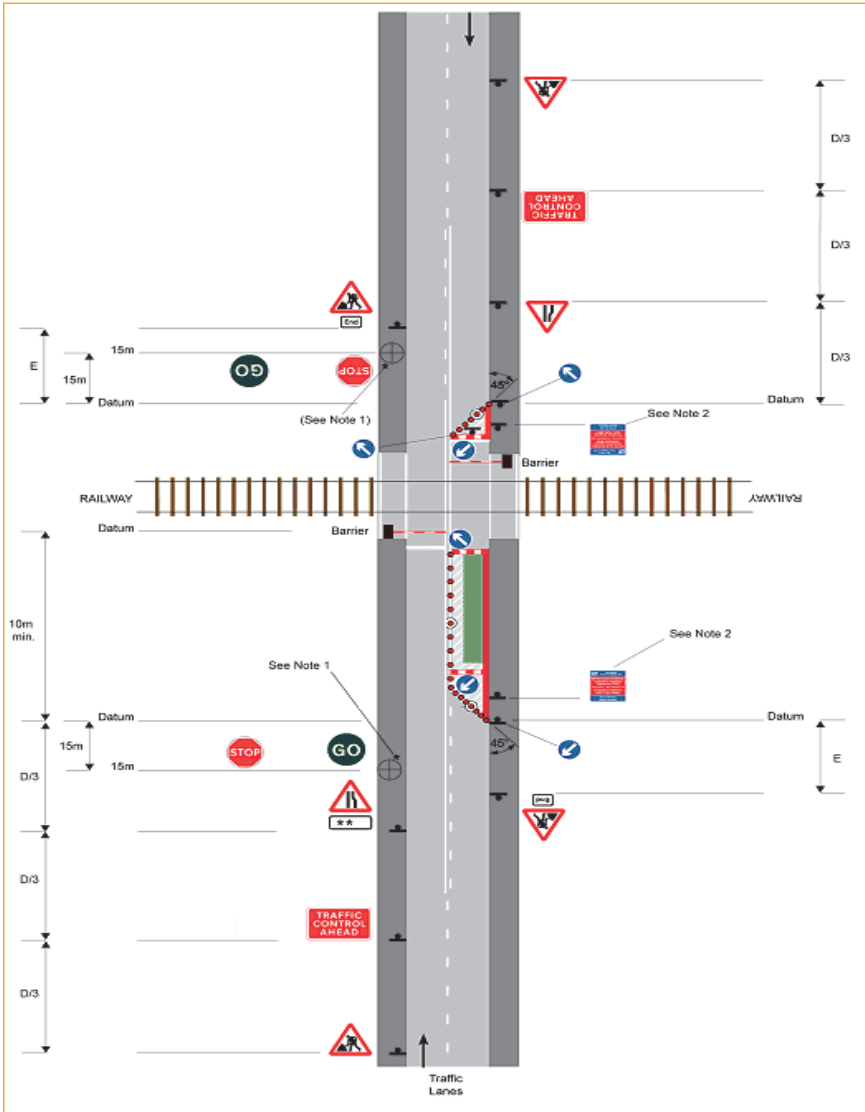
WORKS NEAR A LEVEL CROSSING ON A SINGLE CARRIAGEWAY ROAD WITH FOOTWAY NOT OBSTRUCTED (LHS)
